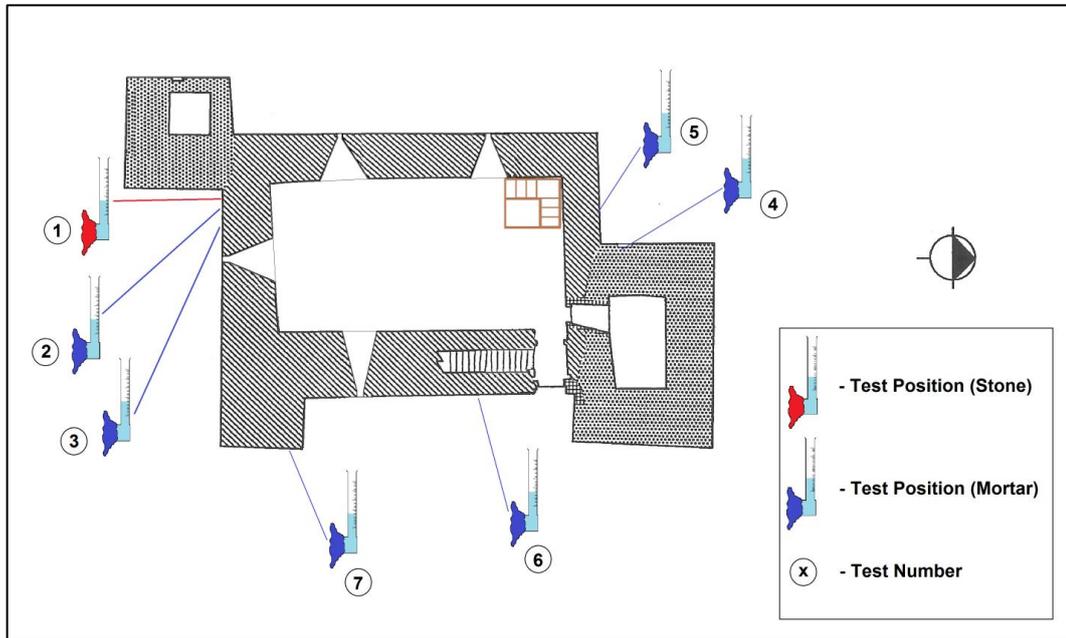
RILEM tube test number and positions on the exterior ground wall of Barryscourt
